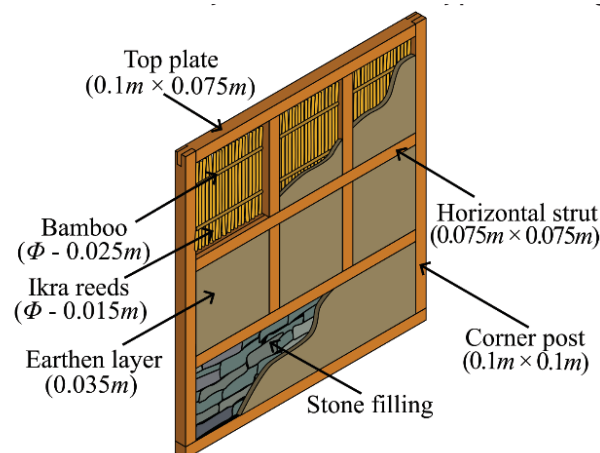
Typical sketch of a wall system in Assam-type buildings
